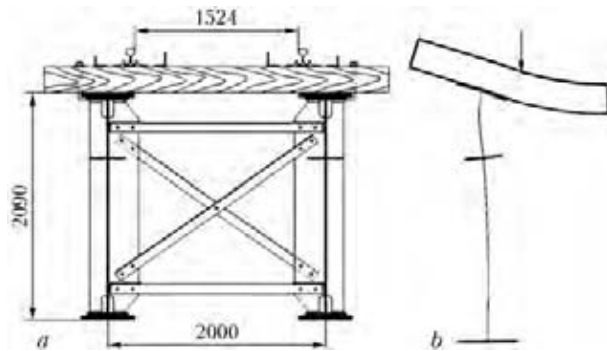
Cross-section of welded span structure of bridge (a) and out-of-plane deformation of its web (b)
